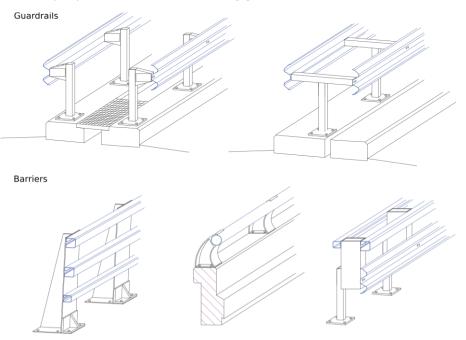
Examples of guardrails and safety barriers (adapted from « Dictionnaire de l'entretien routier. Volume 5 : ouvrages d'art », Cerema, 2008)
